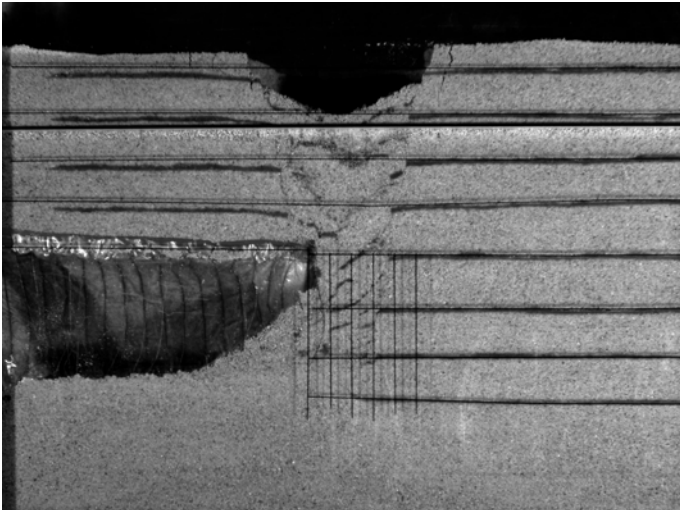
Daylight collapse in flexible lining case with 1D overburden in model test.
